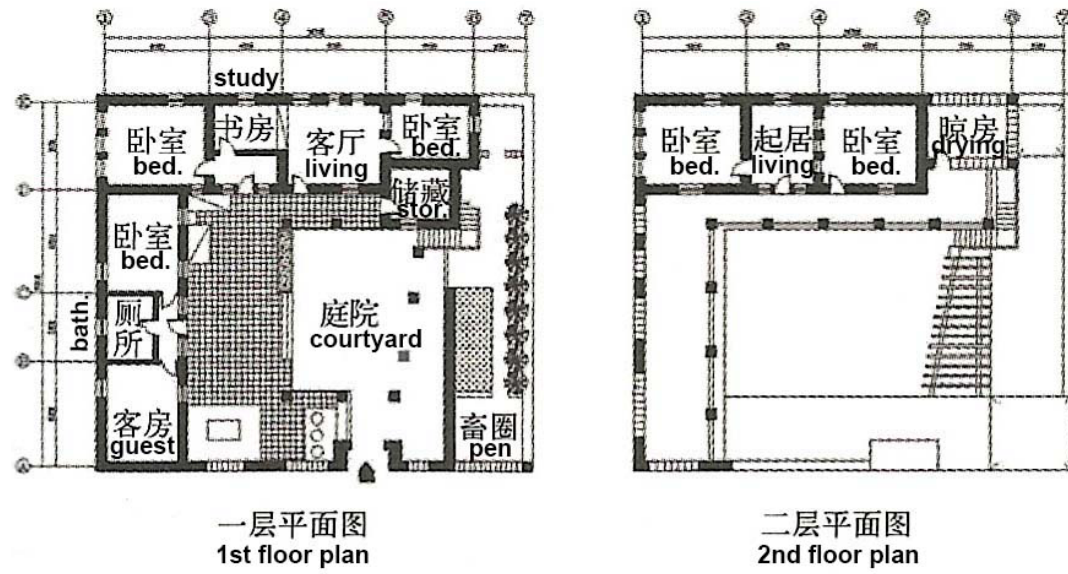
(top left) Floor plans for Design 1 for new residential houses in a new village in Shanshan County.¹
